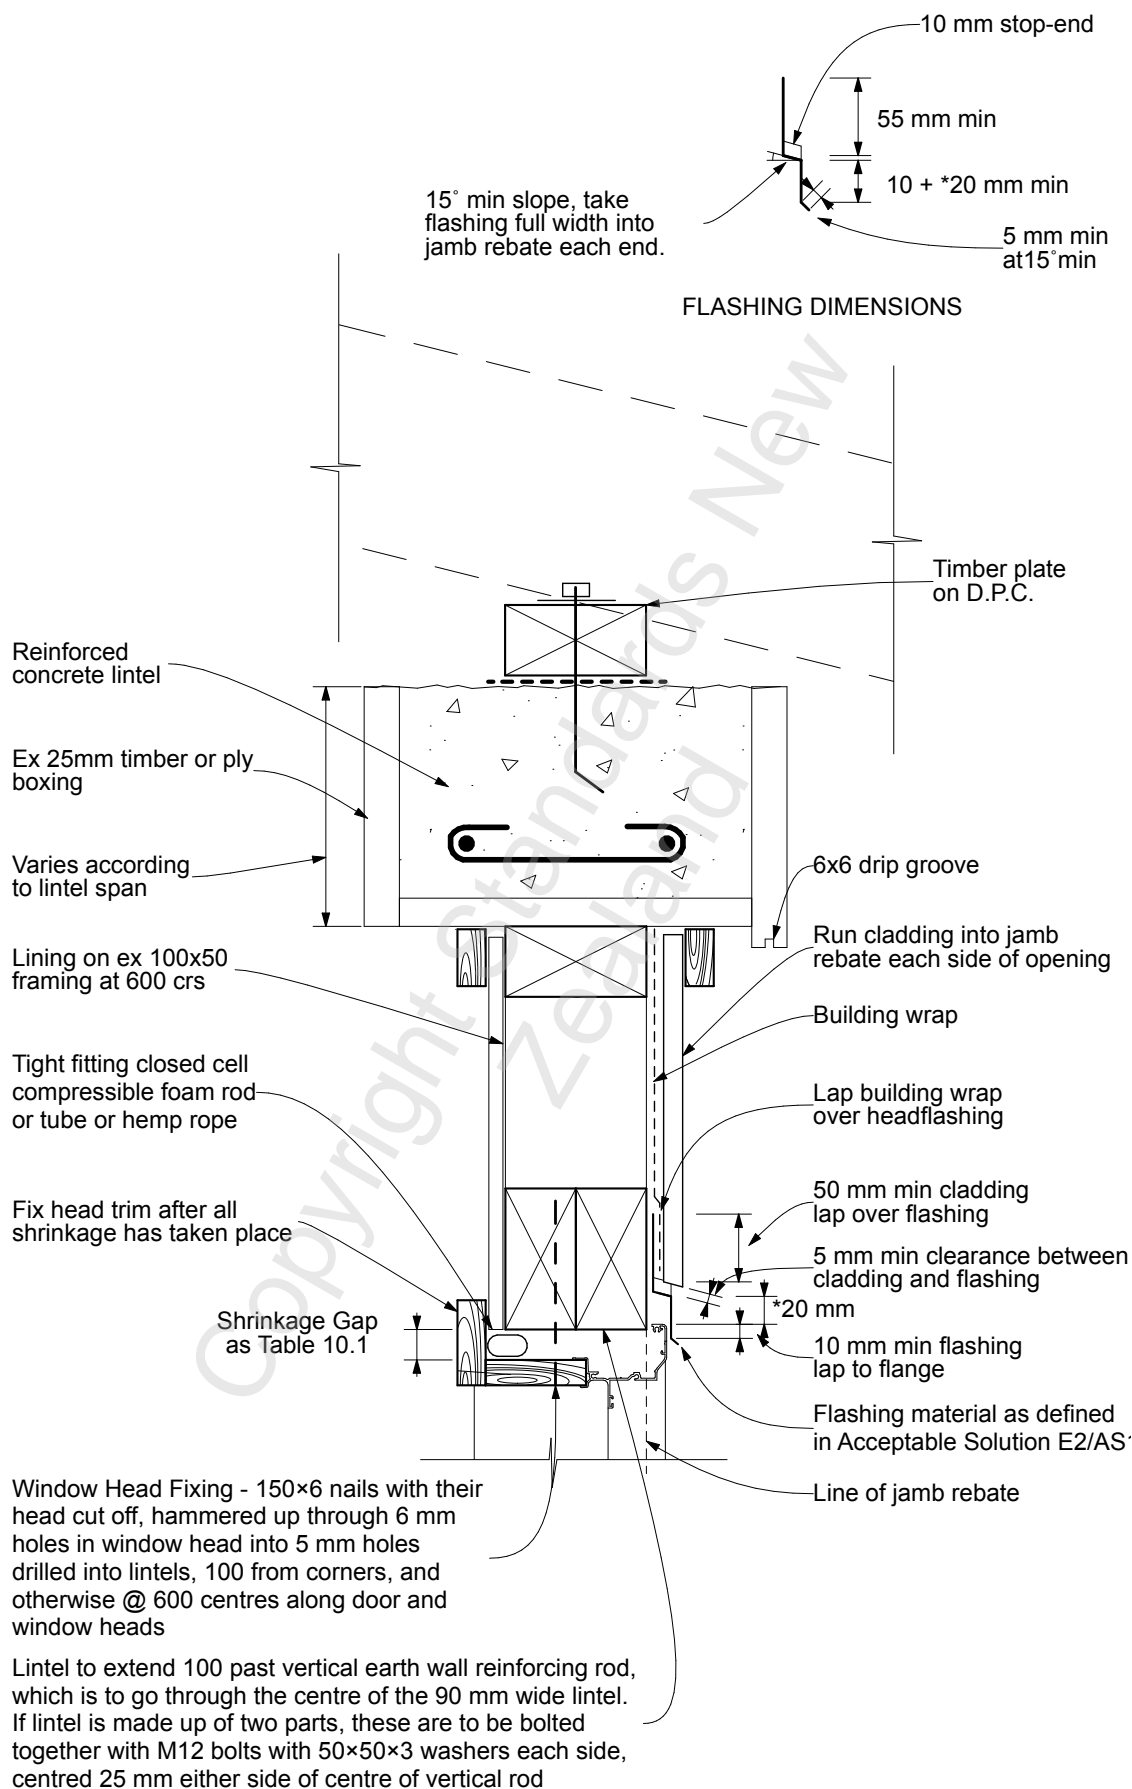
Window head – Aluminium joinery with timber-framed wall insert
